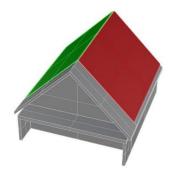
Illustration of the PV panels installed on both sides of the roof.
